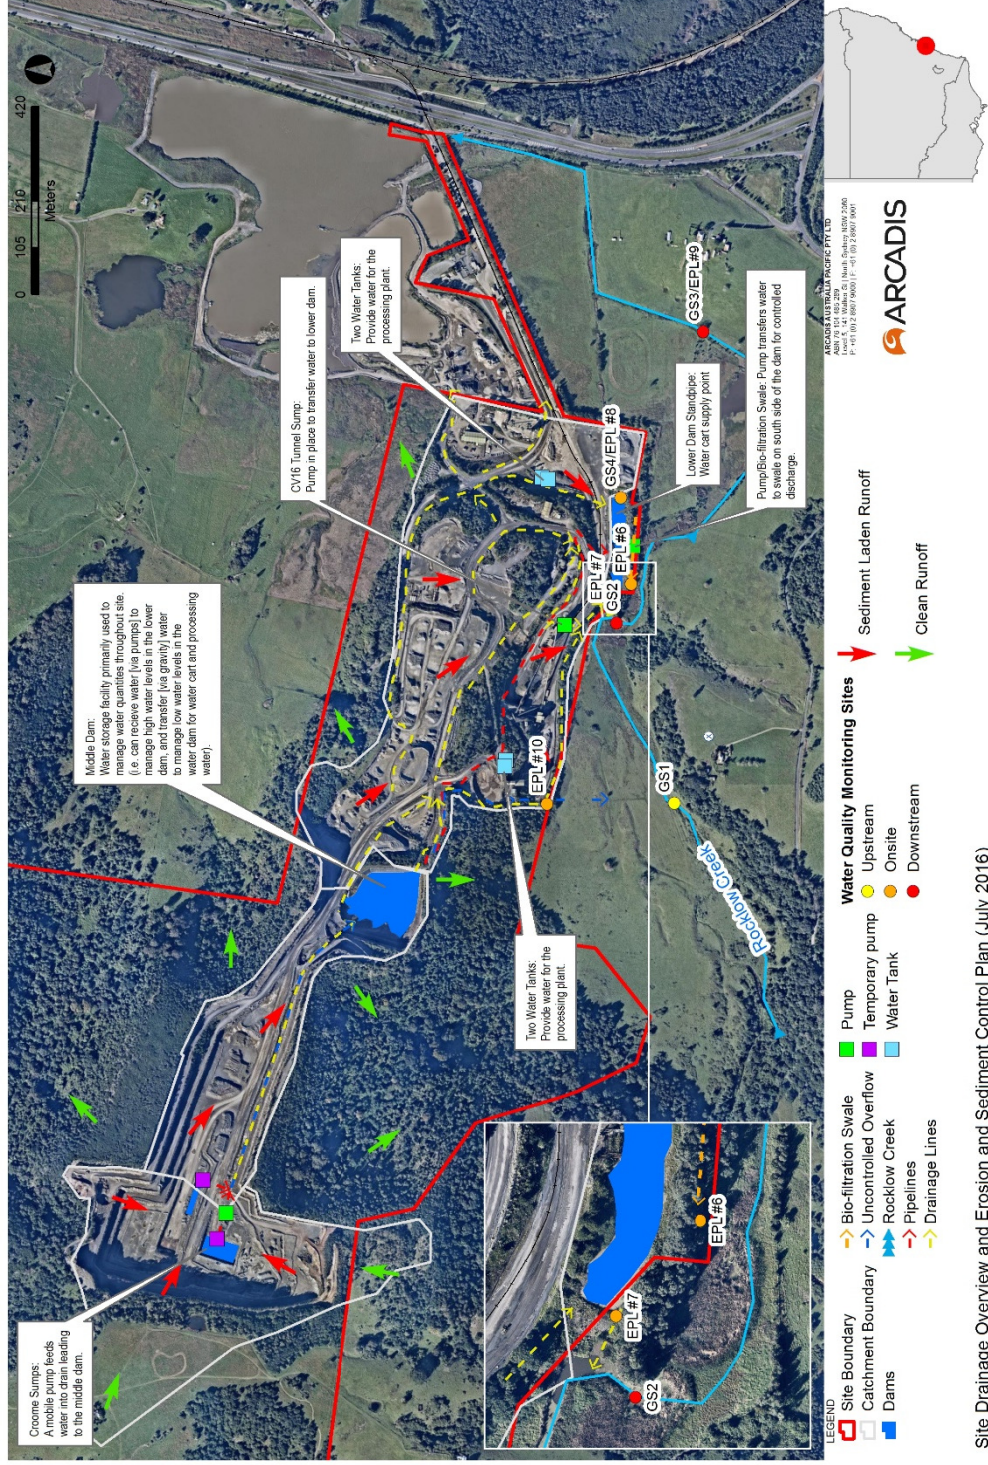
Site Drainage Overview and Erosion and Sediment Control Plan
